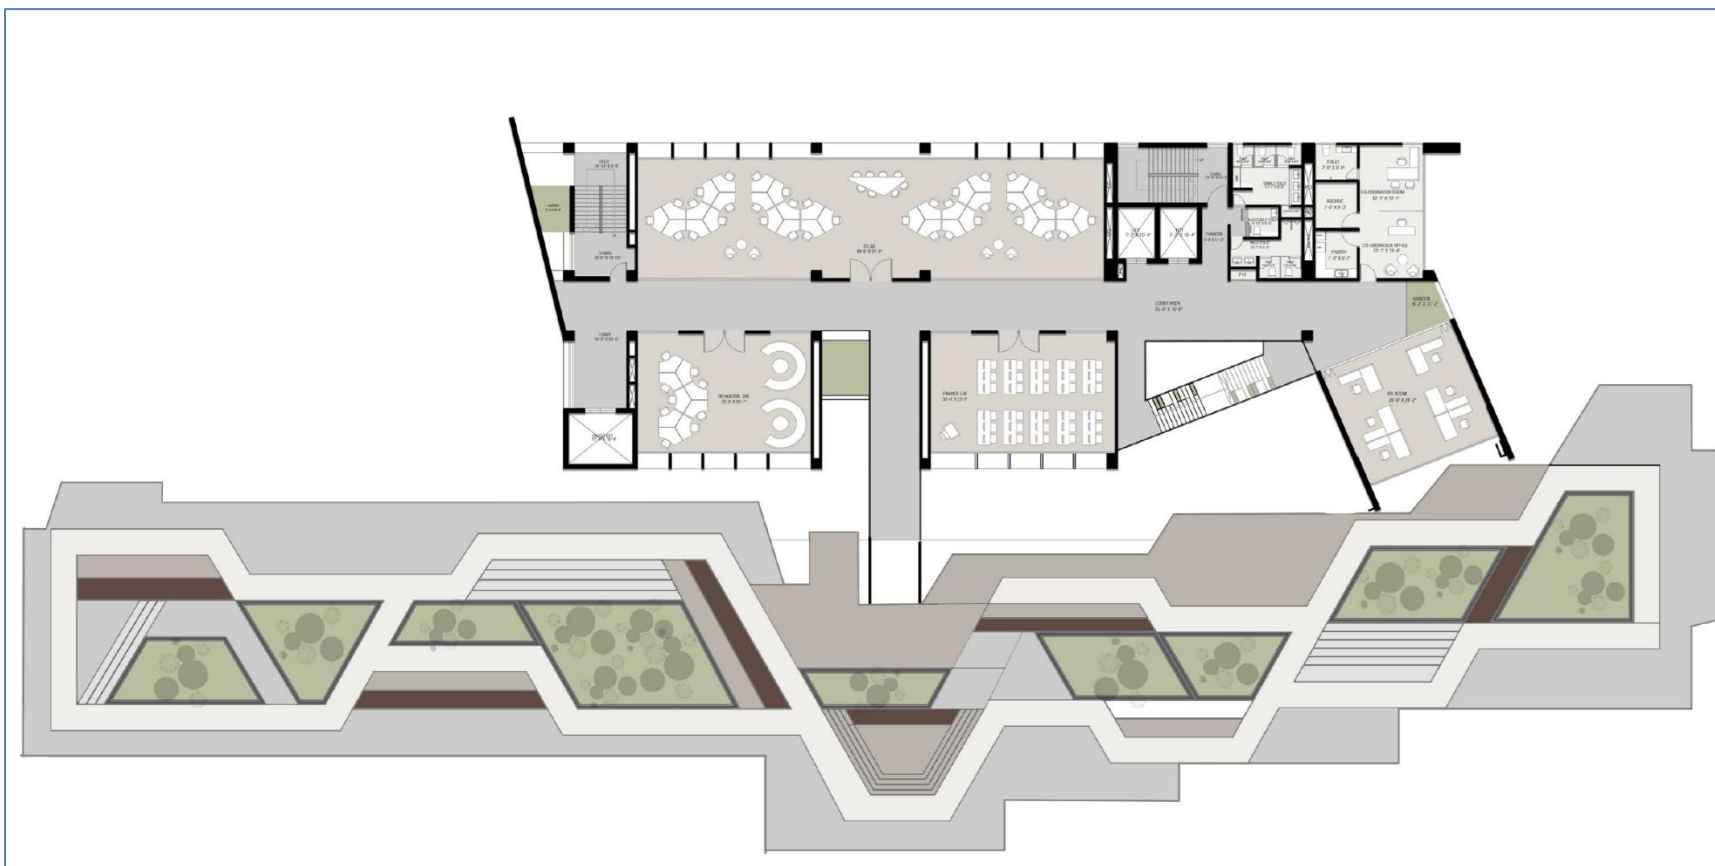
Rooftop view of the proposed Annex IBA building. Green patches indicate ‘green space’
